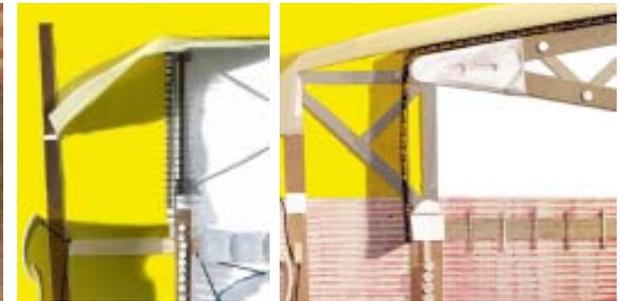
,63b Relationship of roof truss and columns at north-south and east-west section
